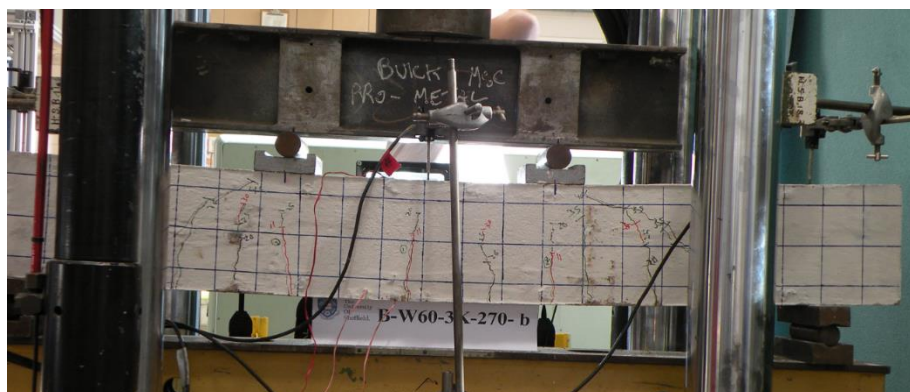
Crack pattern and failure mode of beam1 loaded and stored in conditioned in water at 60°C (B1-W-270d-3k).
